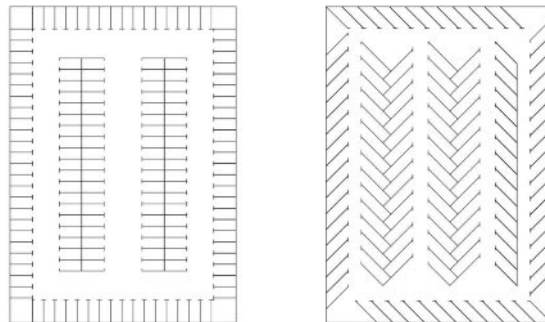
Parking lots with vertical and oblique arrangement of parking spaces
